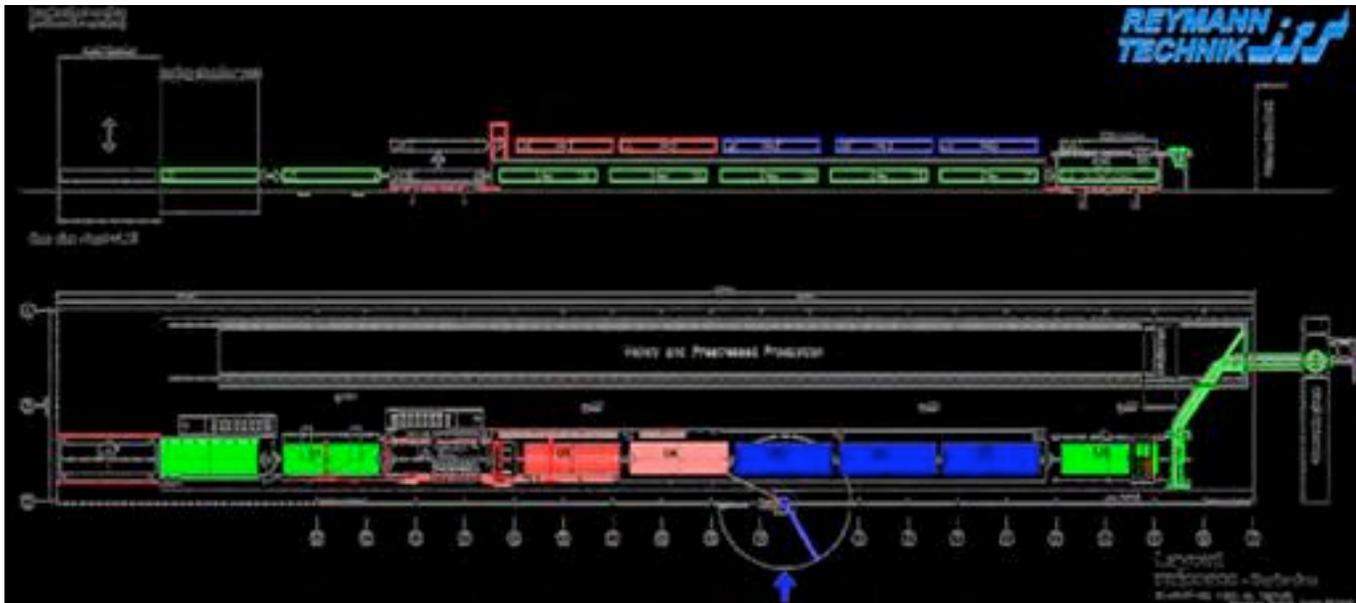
Layout of the Preconco plant. From autumn 2008, a flying bucket conveyor will be added to the plant to serve both the concrete distributor of the circulation plant and the Spancrete plant, as well.
